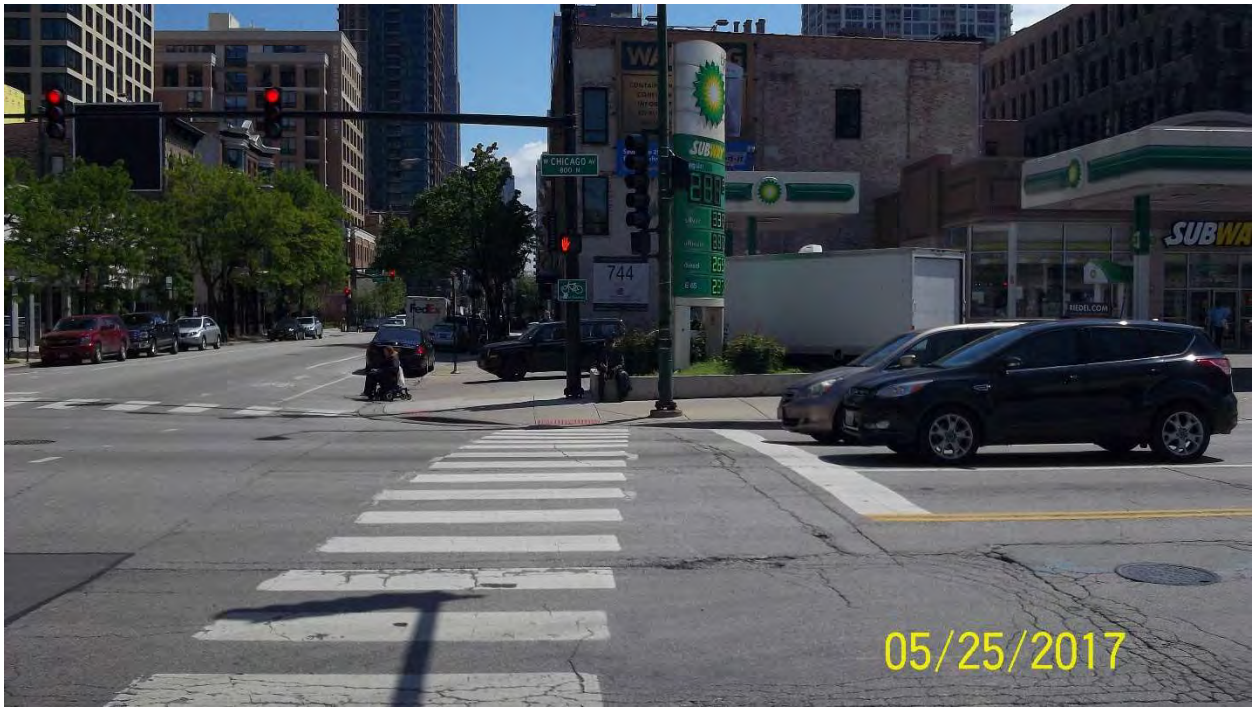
Northwest corner of Chicago Ave. / Wells St. – Looking South
